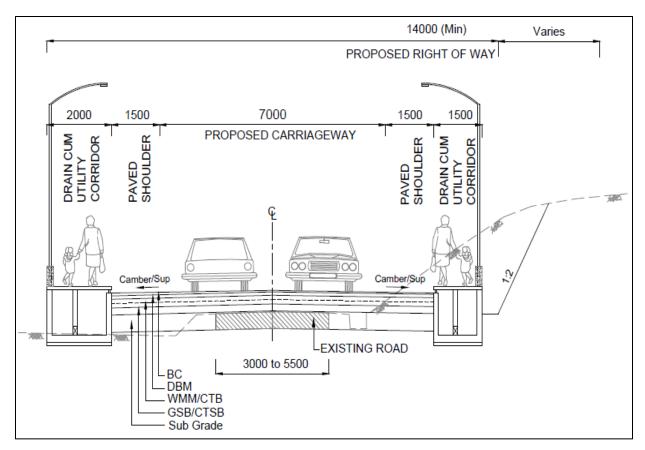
TCS-4: Typical Cross Section for 2 Lane with Half Cut in Existing Section (RHS)
